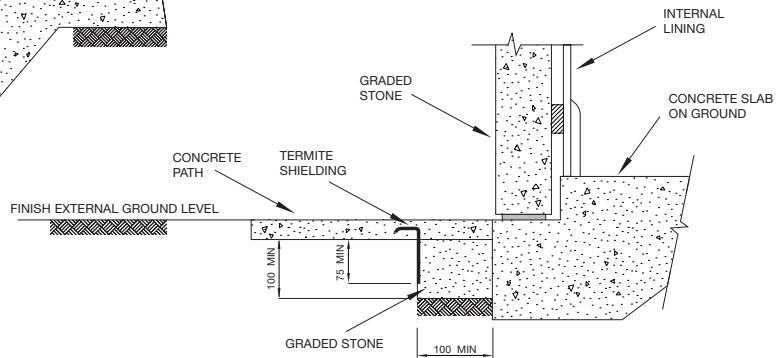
Typical Detail for Graded Stone External Perimeter Barrier at Slab with Separate Strip Footings
